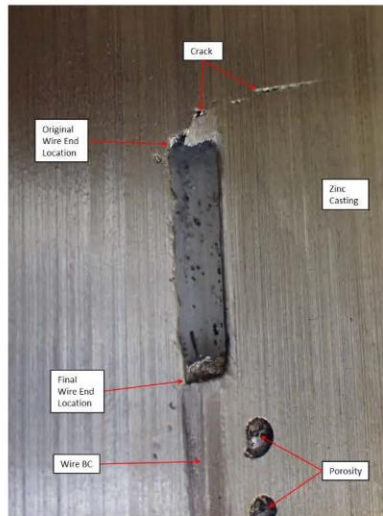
Close up view of the wire-end displacement of wire BC within the zinc casting. A crack appears evident on the casting cap, which would be a potential ingress route for moisture. Additionally, several pores can be seen adjacent to the wire. This image was taken from the 3 o'clock half.
